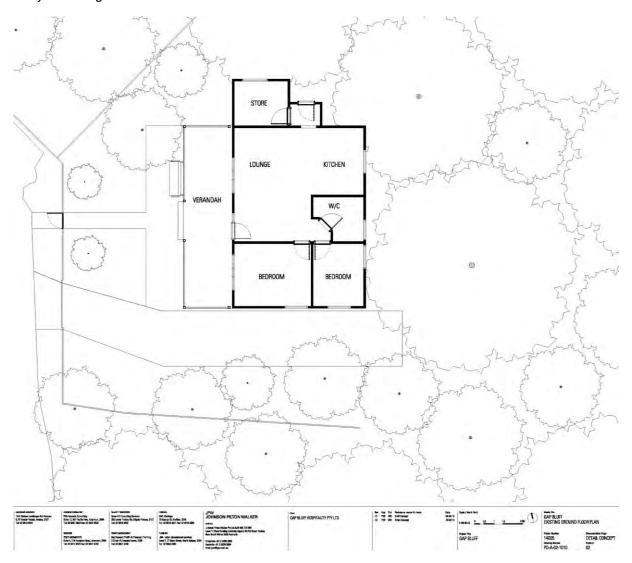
Floor plan, Gap Bluff Cottage. (Source: JPW 2015)
